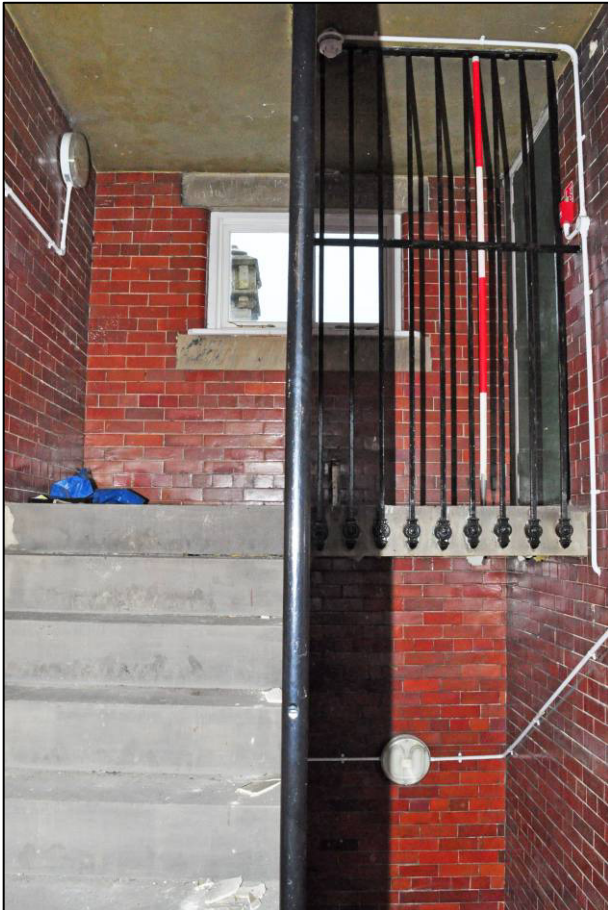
1908 Higher Grade Girls' School, stair tower (2F24), access to roof, looking N (photo 2366).
